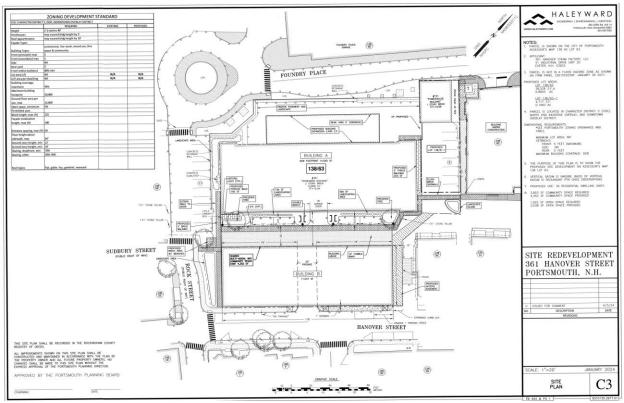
Proposed Site Plan for the Approved, "As-of-Right" Design Review Plan
